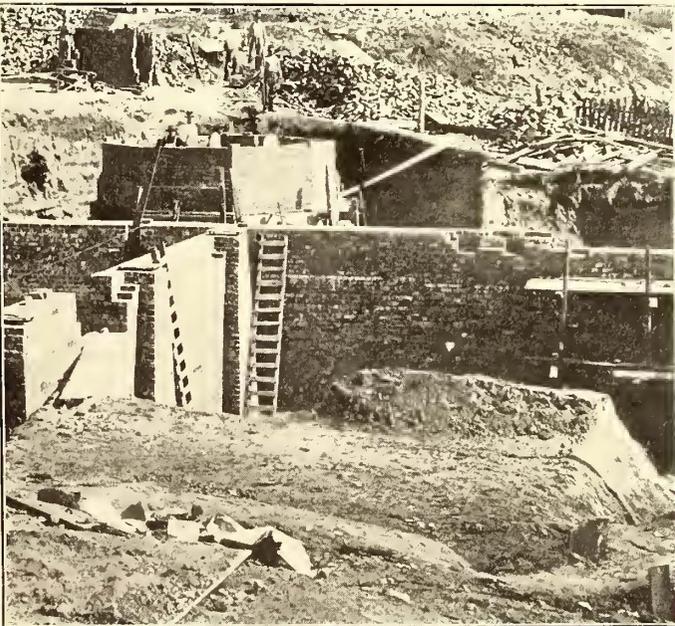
FOUNDATION WALLS FOR NEW STATION
